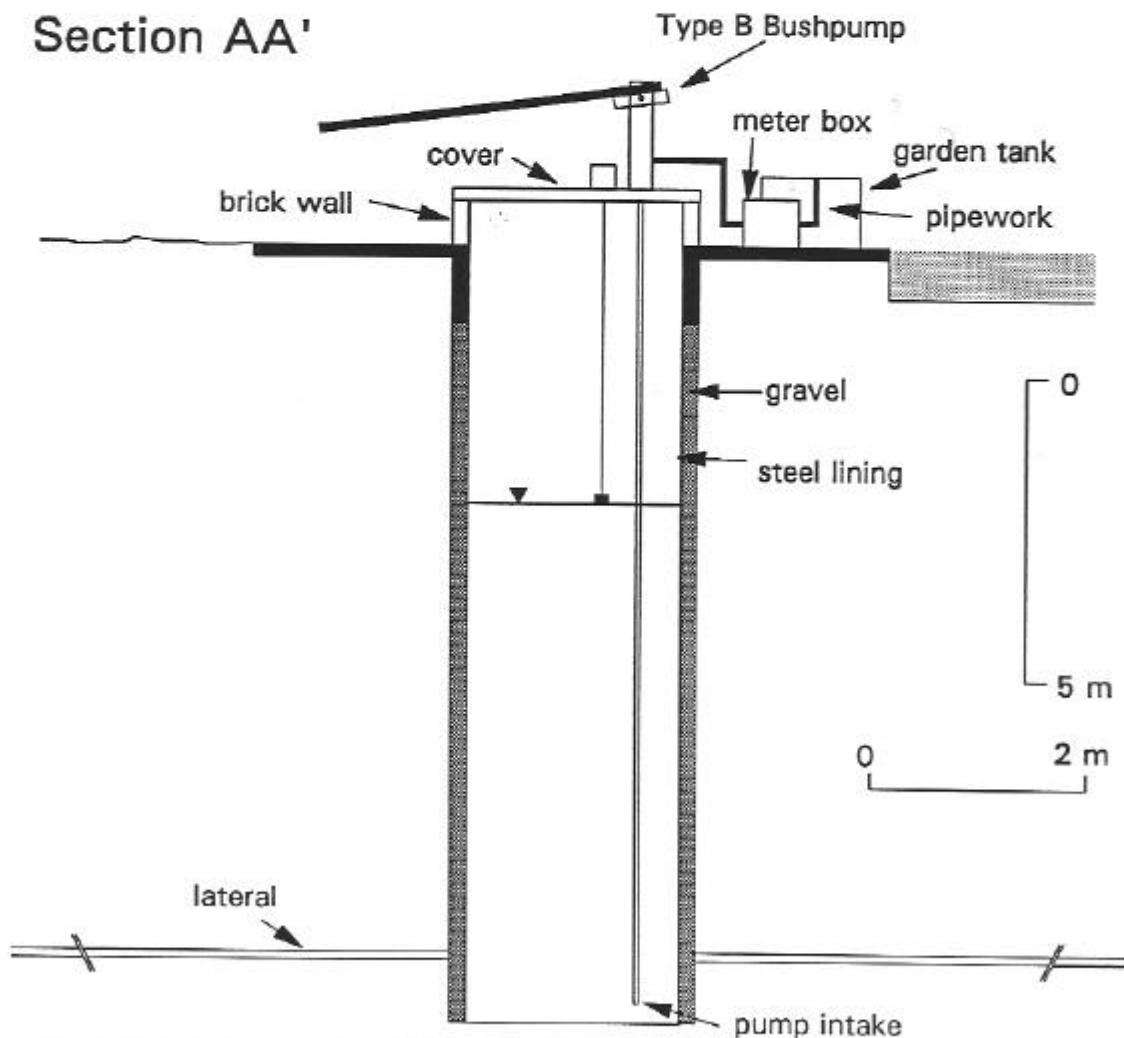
Collector well and headworks construction, site 5, Mawadze
